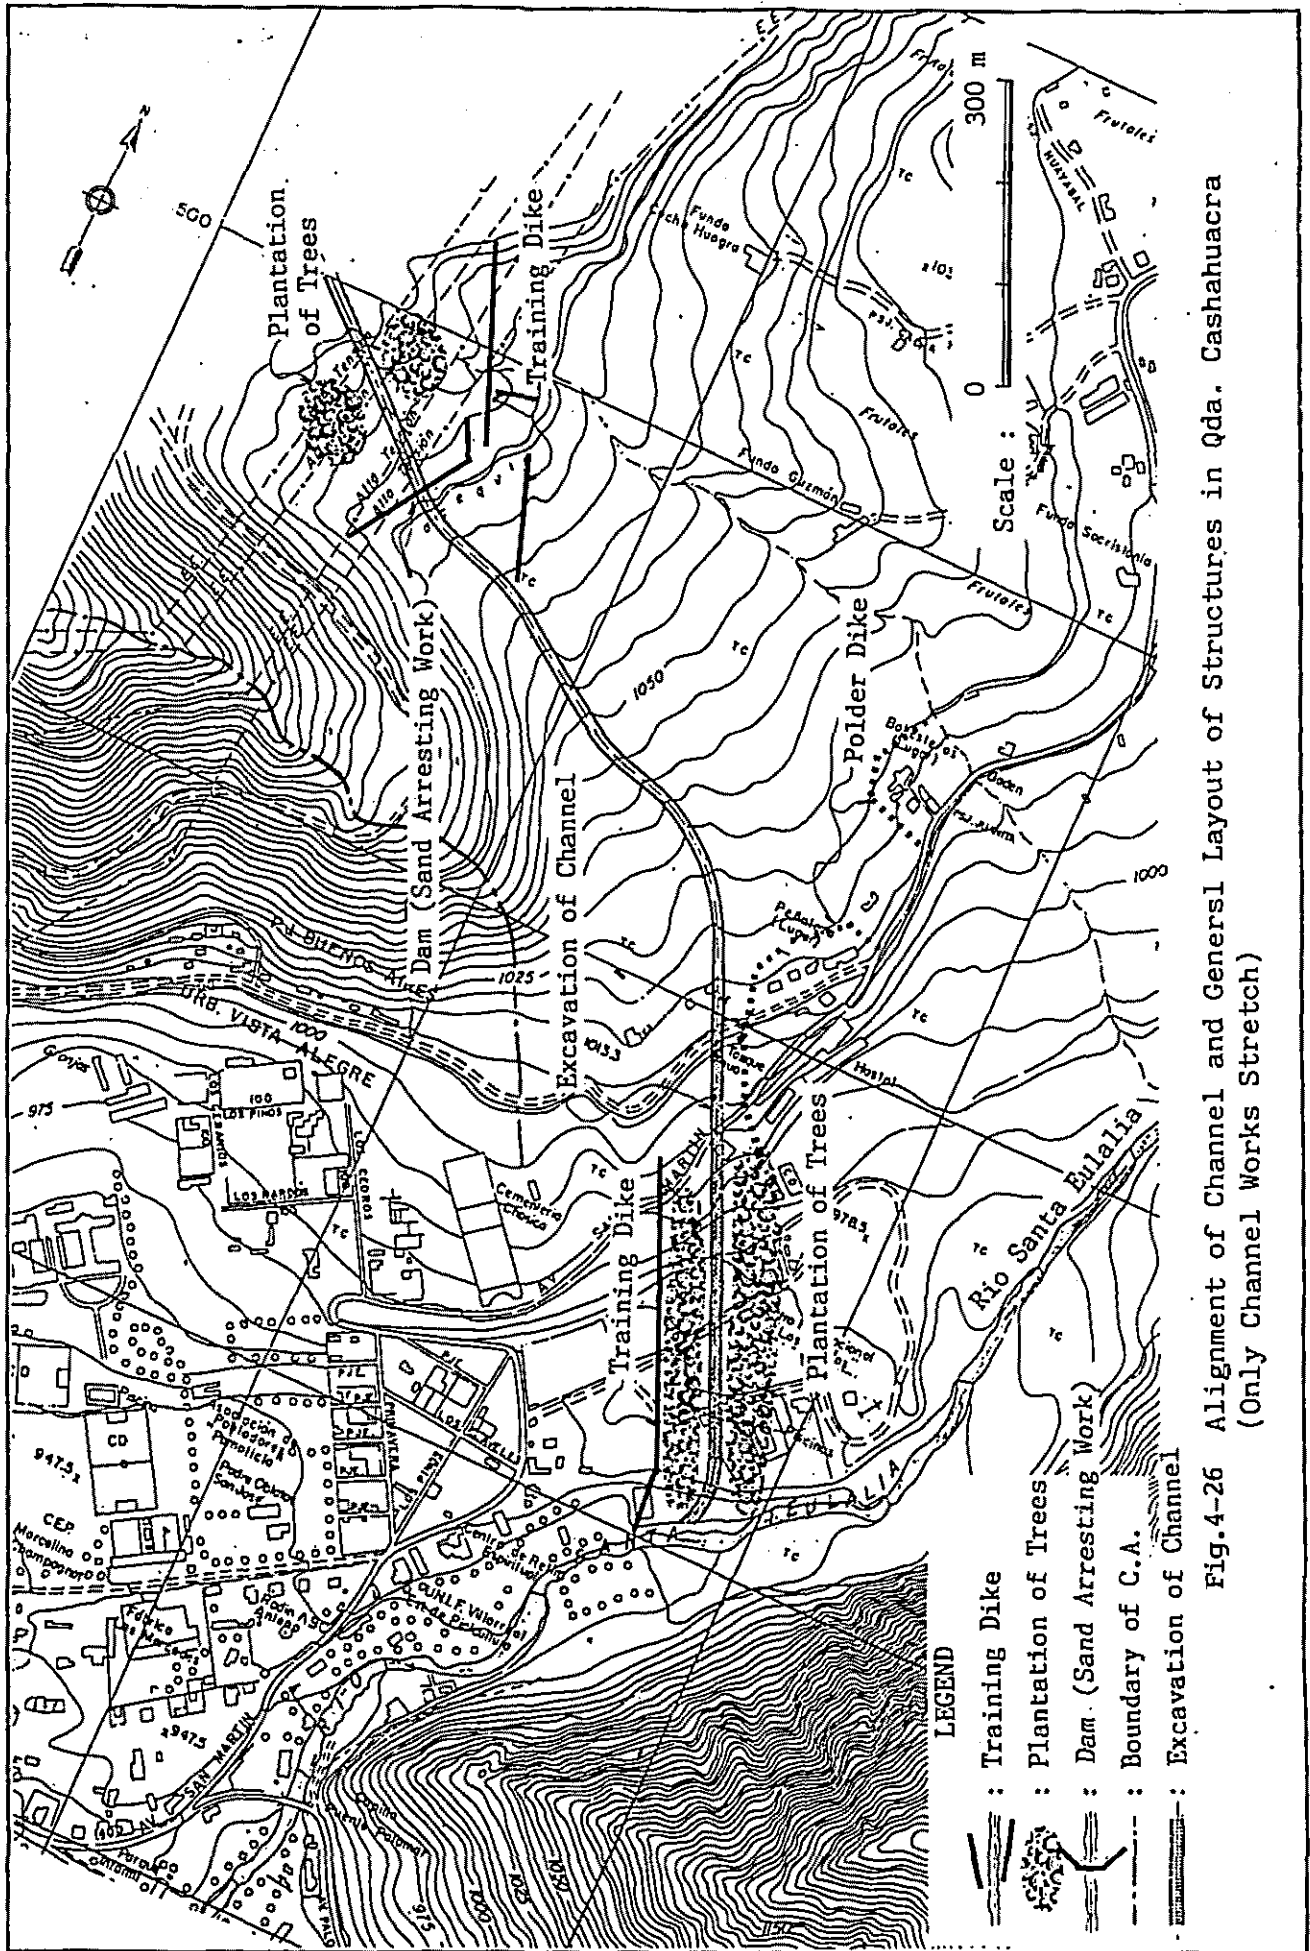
Alignment of Channel and General Layout of Structures in Qda. Cashahuacra
